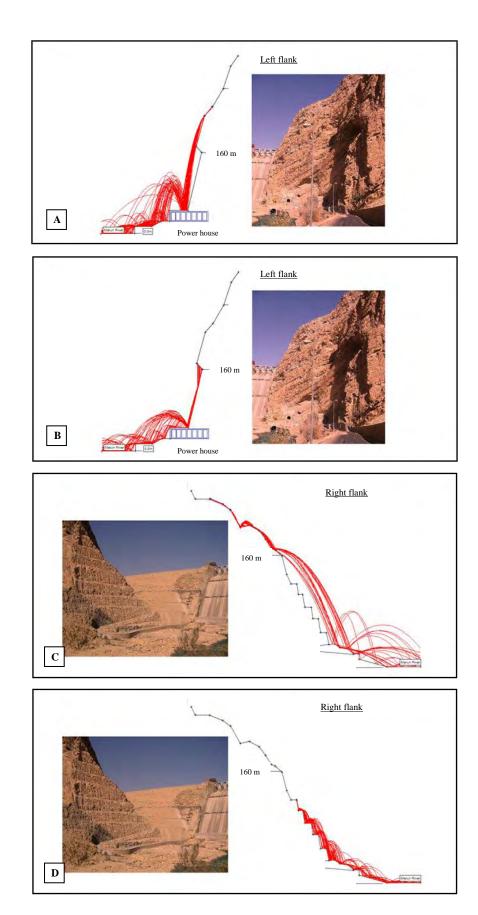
Rockfall hazard at Marun dam site in successive stages on the left flank (A, B) and right flank (C, D). The power plant and access roadways are subjected to rock fall hazard every day.
